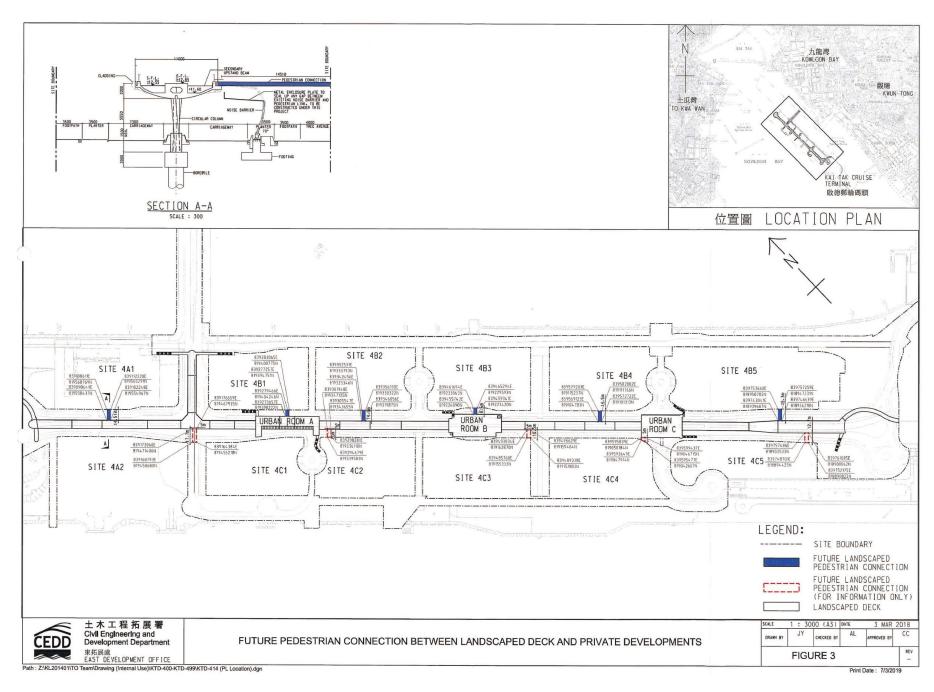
Future Pedestrian Connection Between Landscaped Deck And Private Developments
